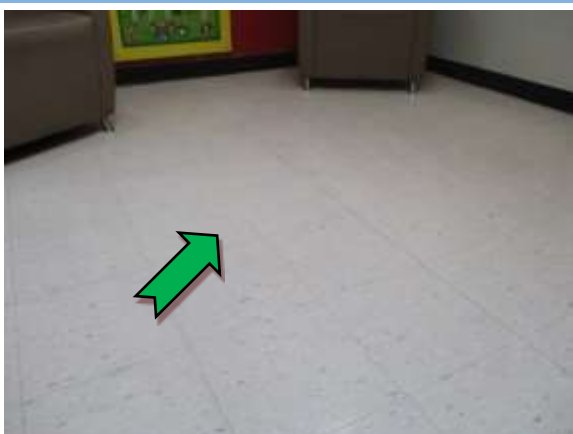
Ground level, baby change, floor – non asbestos-containing vinyl floor tiles.
